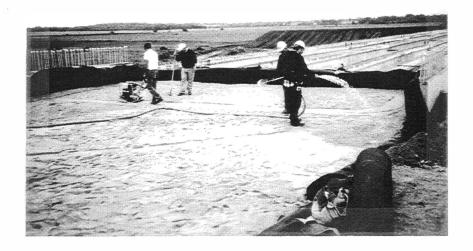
Compaction of Granular Backfill, South Abutment, Bridge B
